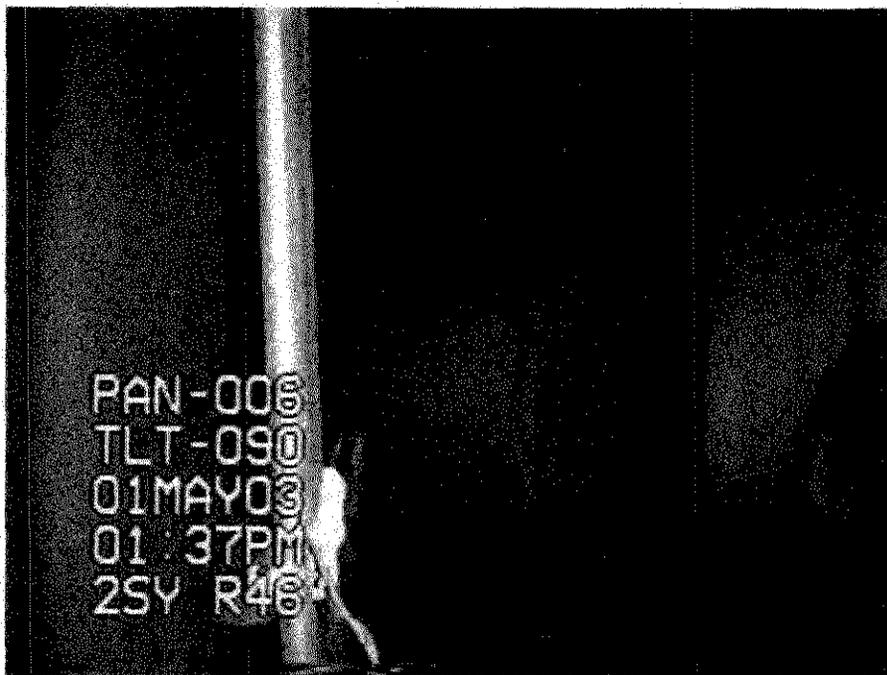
SY-102 Riser 46, Secondary Tank Wall (Left, 2003)
